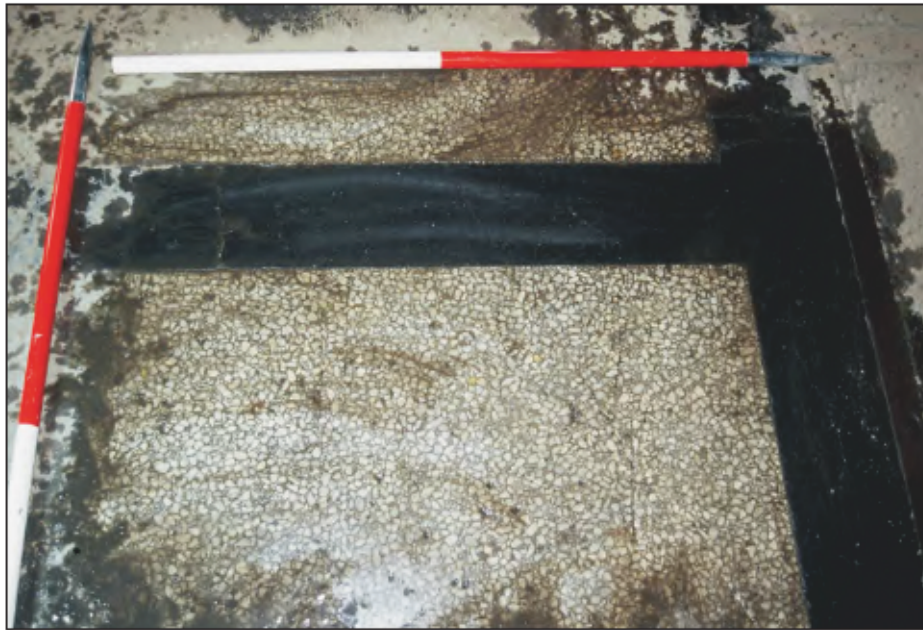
Detail of terrazzo floor with black trimming, Building 10. (colour slide 5)
